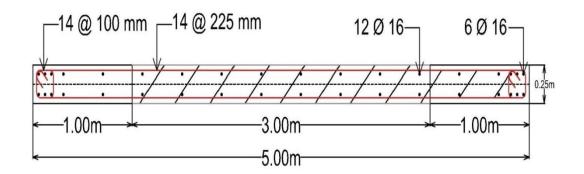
Steel reinforcement of shear wall with opening 3.0mx1.5m (Window)
